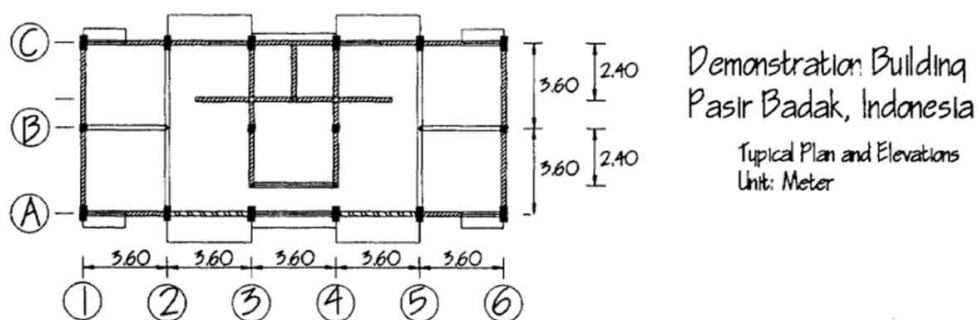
Typical plan of the demonstration building (Courtesy of Prof. J.M.Kelly, University of California, Berkeley).
